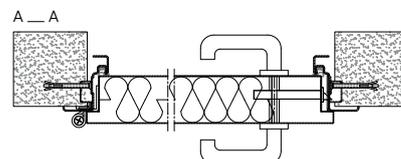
Horizontal cross-section of the ECO Tech external seamless steel door with a corner frame
